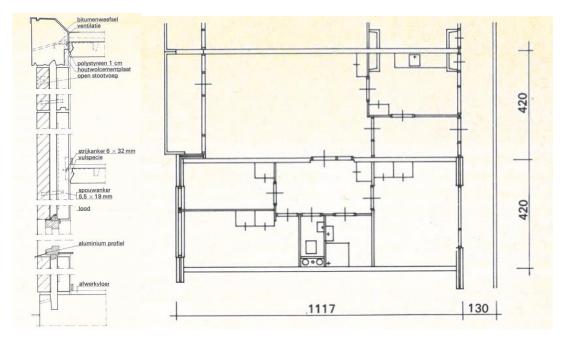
Facade section and plan for the BMB system (Priemus & Elk, 1971)
